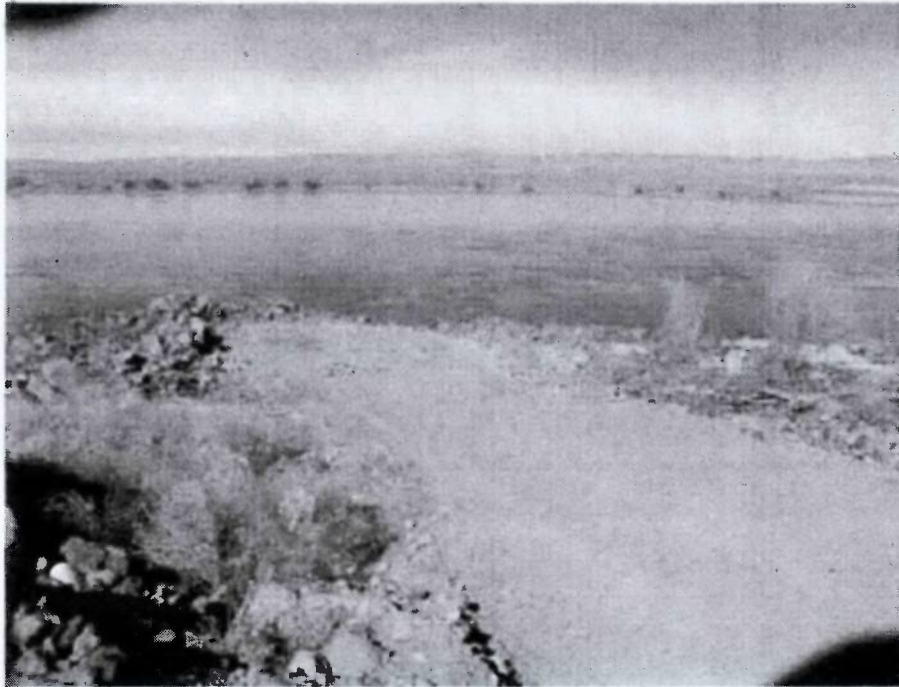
Southern anchor block area after rip rap replaced (facing west).
